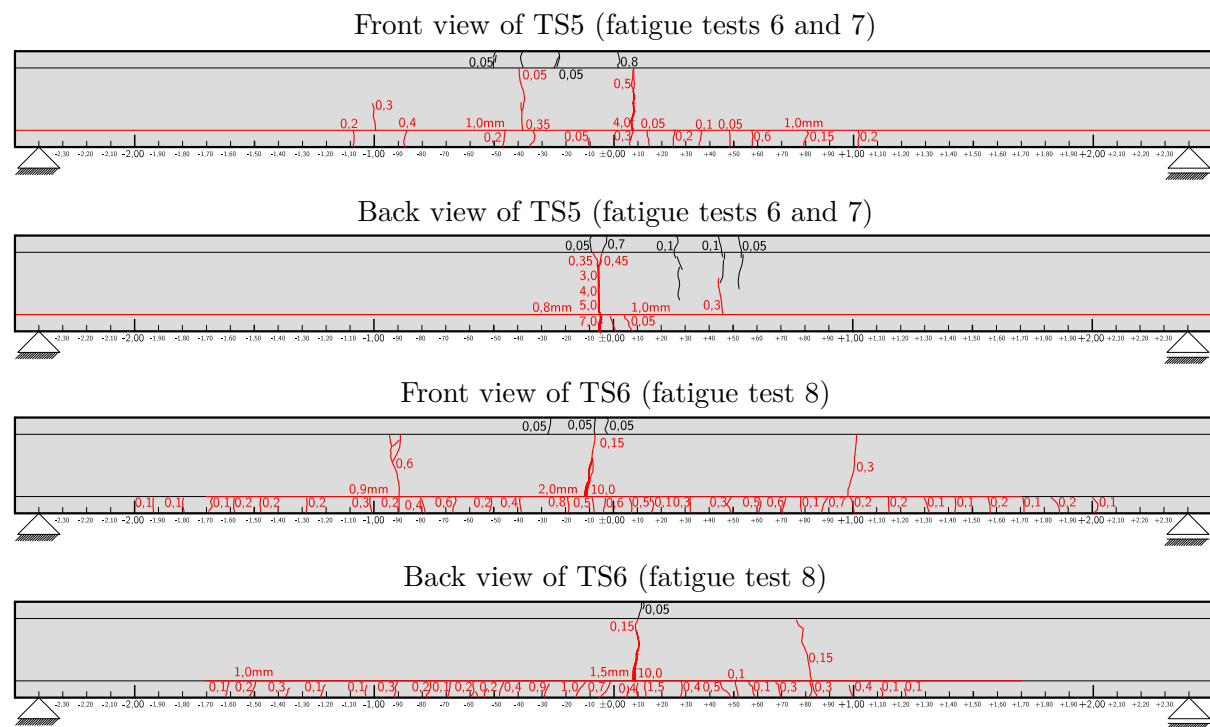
Crack patterns of TS5 and TS6 after static testing
